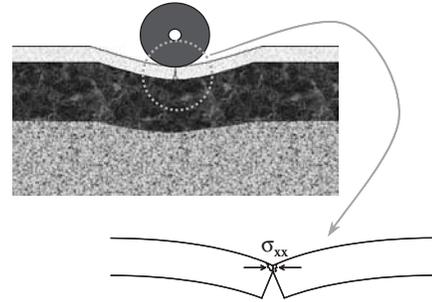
Joint spalling mechanism in ALF.
